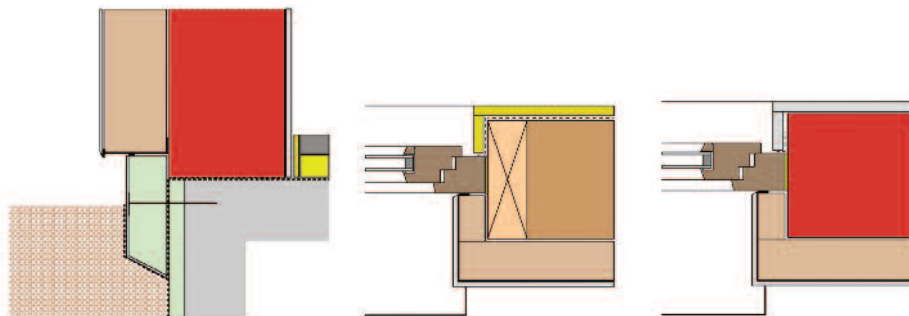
(above): GUTEX Thermowall external insulation solutions. (From left to right), foundation detail, timber frame window detail, block wall window detail
